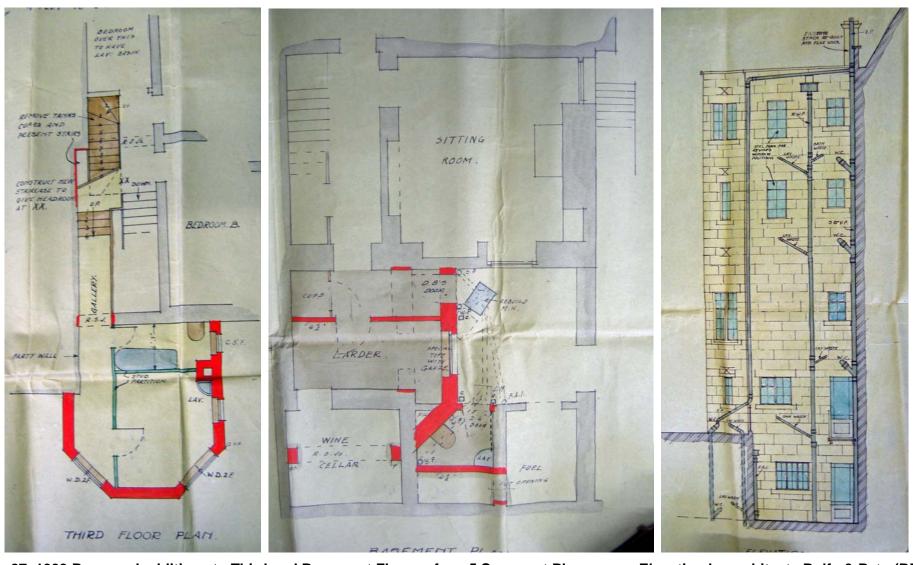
1933 Proposed additions to Third and Basement Floors of no. 5 Somerset Place + rear Elevation by architects Rolfe & Peto (BRO: BC/5000)
